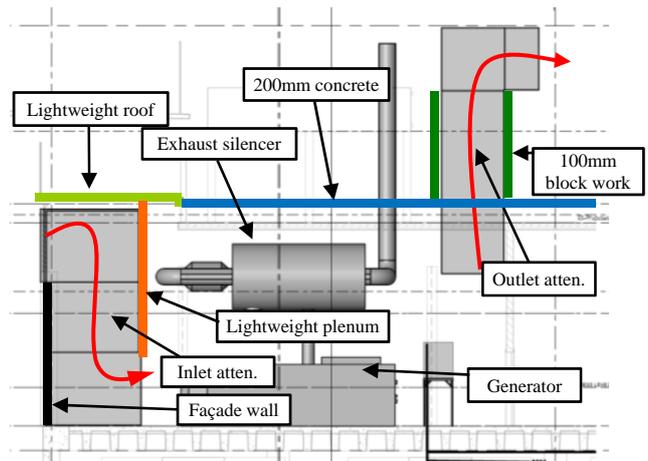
Section view of the generator room design showing the inlet and outlet air paths
